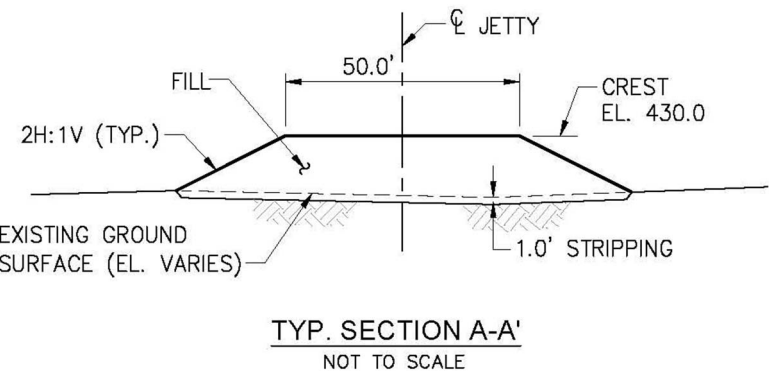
S-2. Typical Cross Section A-A' of Fishing Jetty
